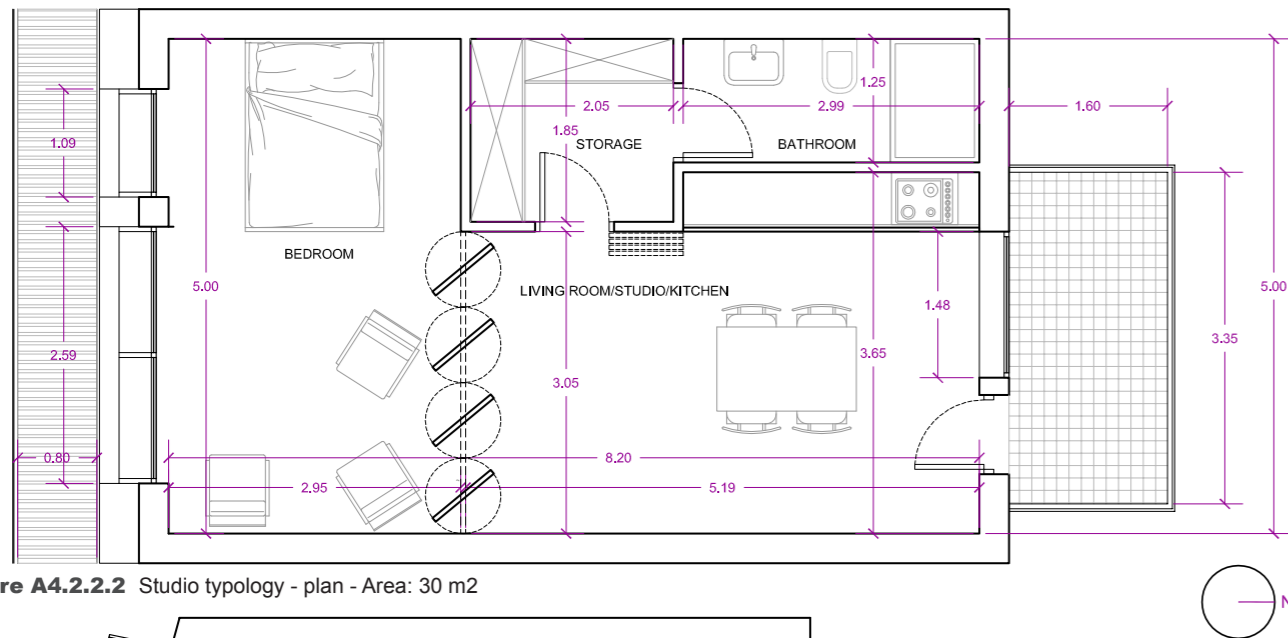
Studio typology - plan - Area: 30 m2
